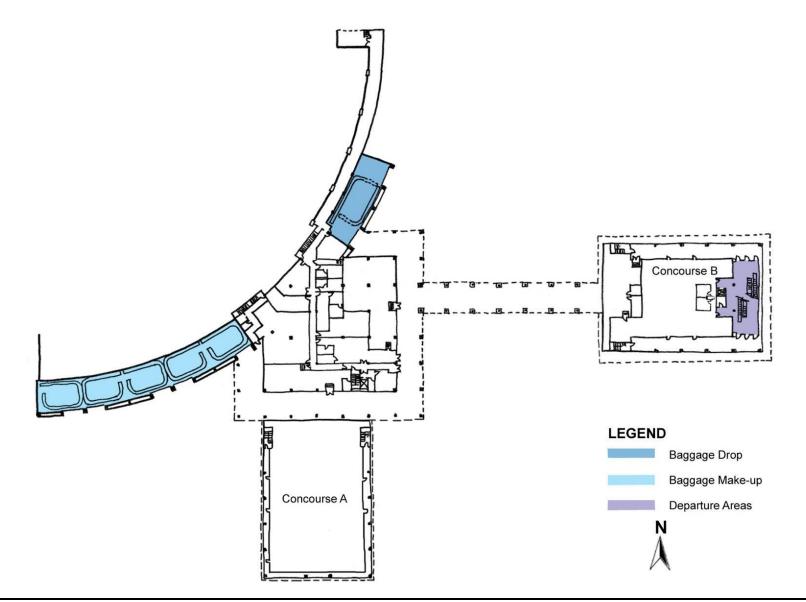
PASSENGER TERMINAL FLOOR PLAN – APRON LEVEL
